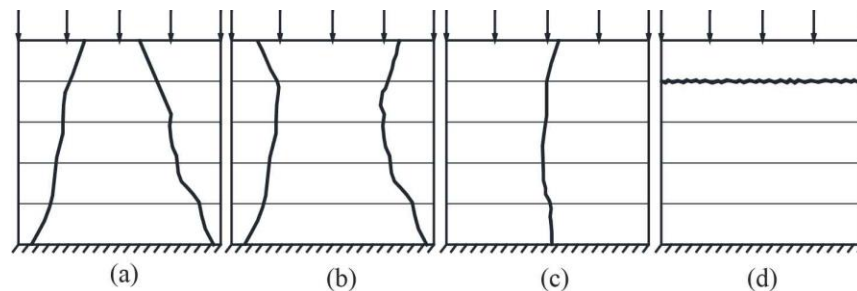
Typical failure patterns of RE wallettes observed under compression loading.
